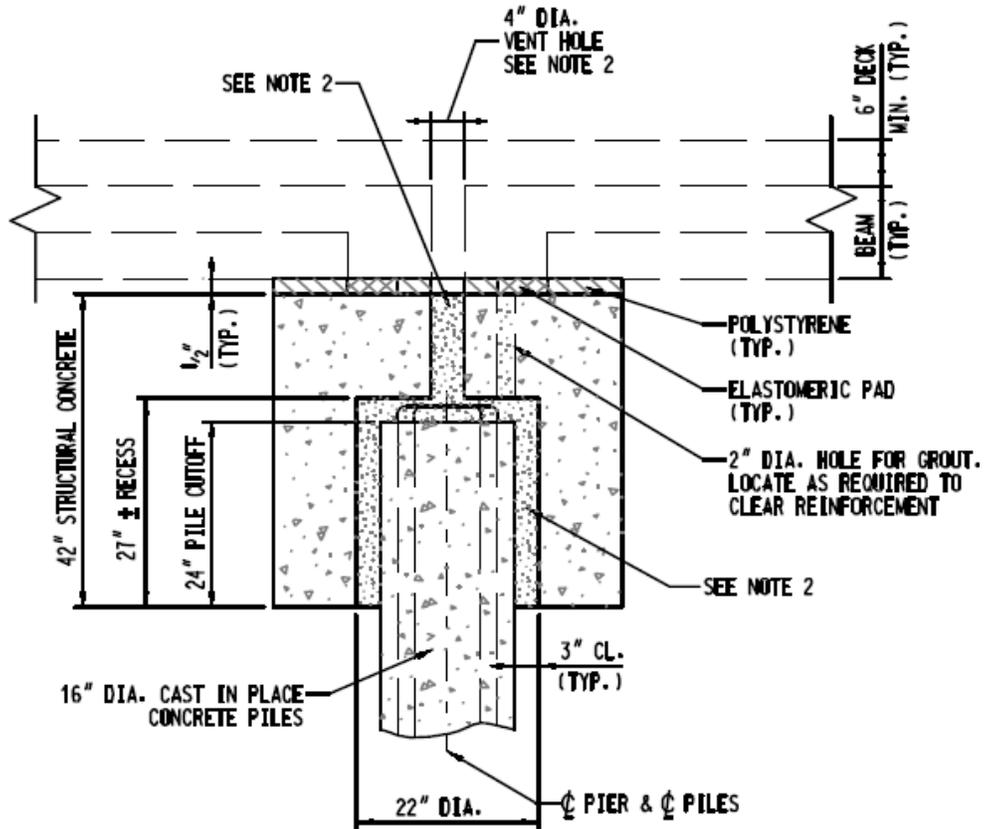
Precast cap beam and cast-in-place column using grouted pocket [2]
